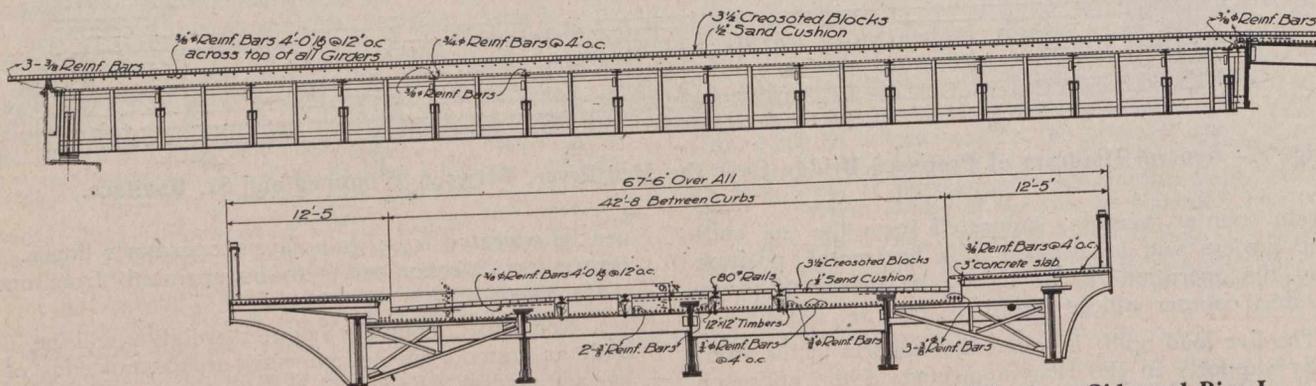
Longitudinal and Cross-sections of Span Between Abutment on the Winnipeg Side and Pier I.
